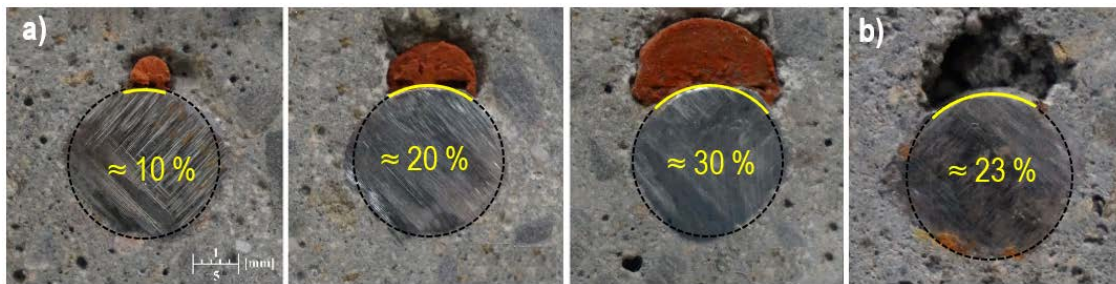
(a) Typical *un-bonded* perimeters (*u.p.*) of cast in-place and (b) of *dry-mix* shotcrete specimens
